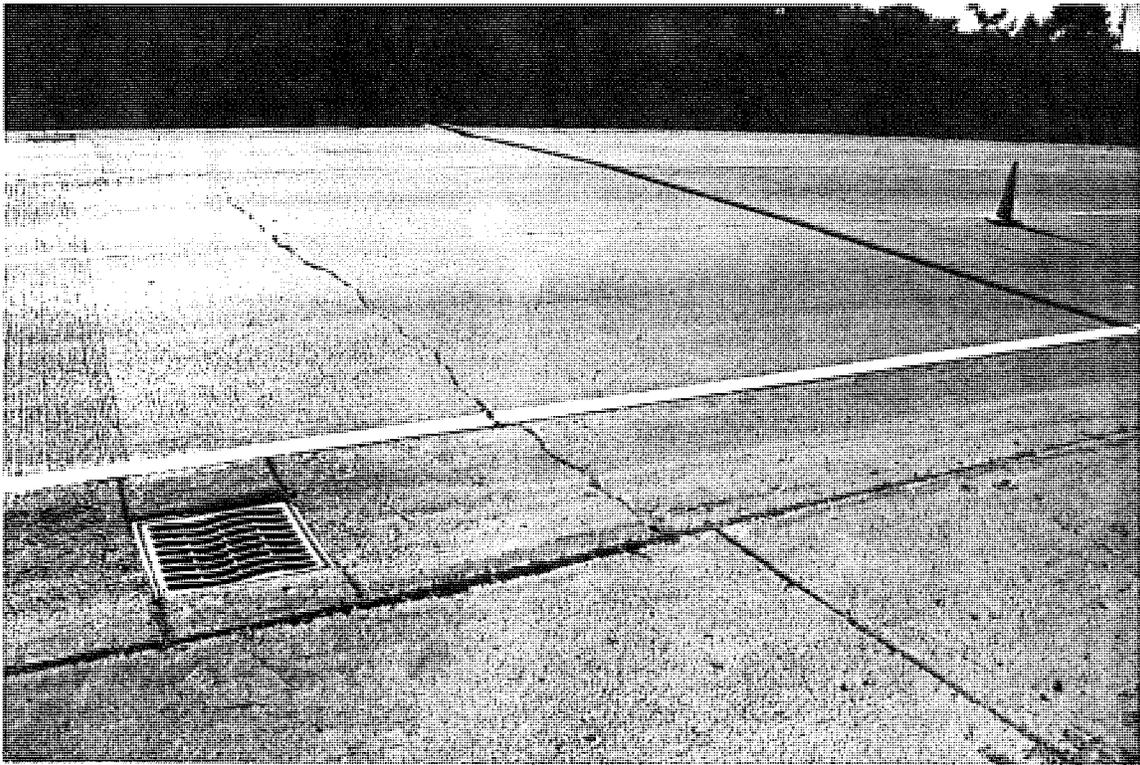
A full width transverse crack induced by the third point intermediate shoulder joints on CSN# 25132-06582A SB.
